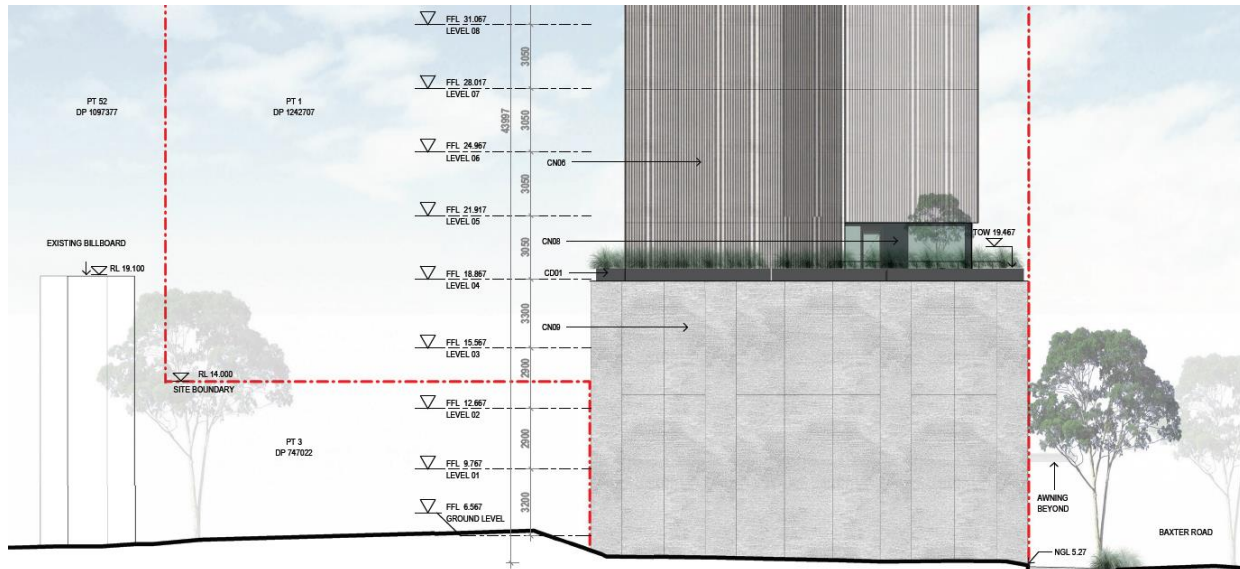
Extract from East Elevation Plan (Source: Group GSA plan DA 206)
